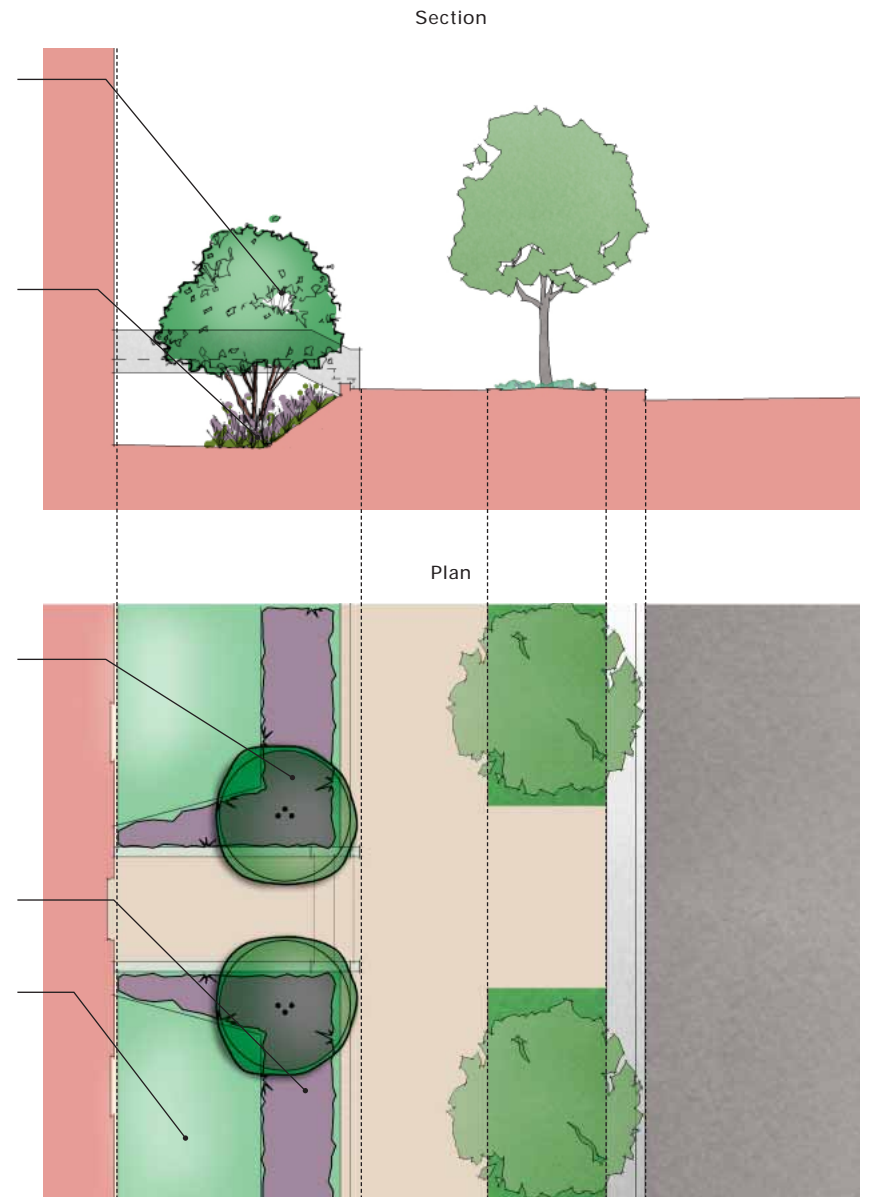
Typical residential frontage with light court showing proposed planting in plan and elevation
